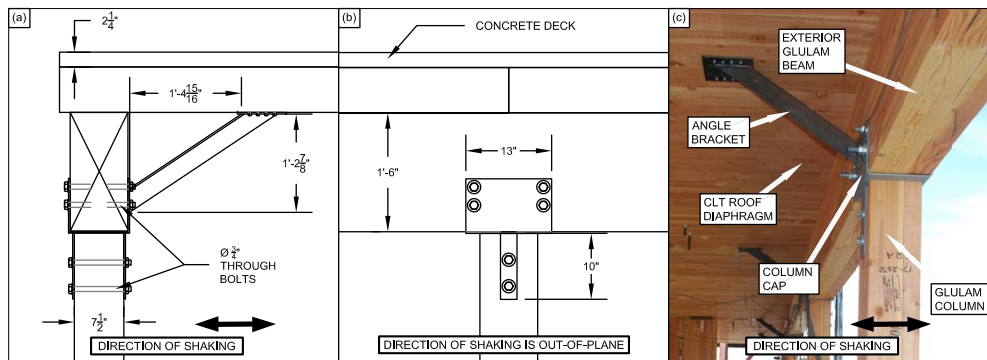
Gravity frame connection joint 5 (a) side view schematic (b) exterior view schematic (c) photo
